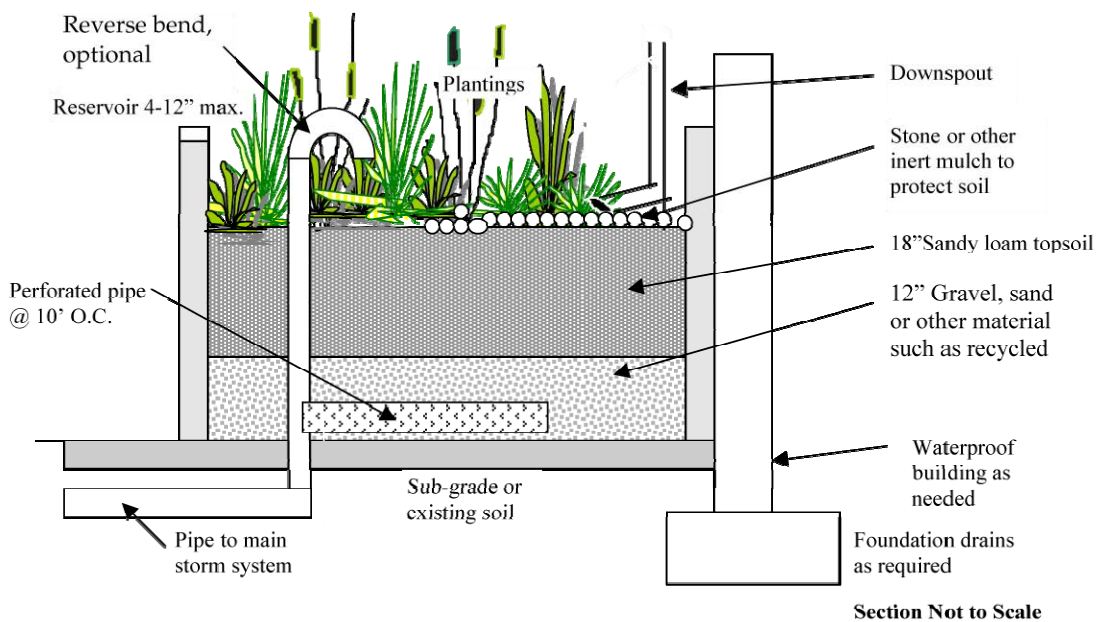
Section of a typical exfiltration BMP adjacent to a building (Source: Liptan and Murase, 2000, p. 17)
